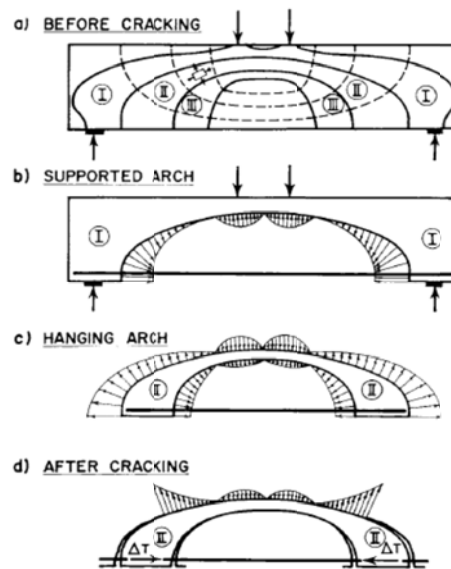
Internal arches in a reinforced concrete beam (Kani, 1969).
